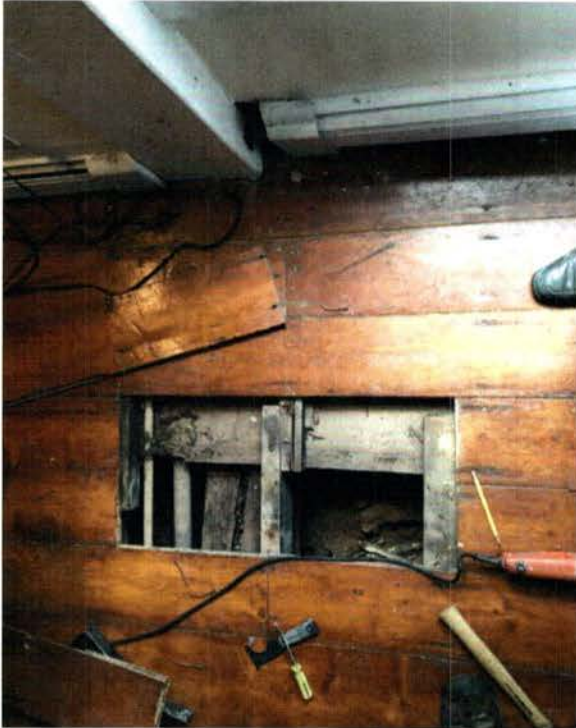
Bedroom #2 (Room 104) looking down at the shallow unexcavated area crawlspace below (004). Earlier floorboards were left in place and the current floorboards were installed over them.
